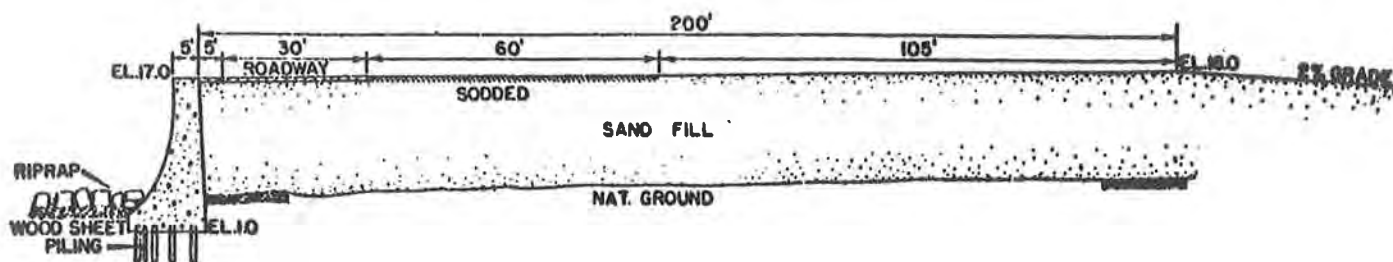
a. 1902—Embankment structure proposed by Robert Board.
